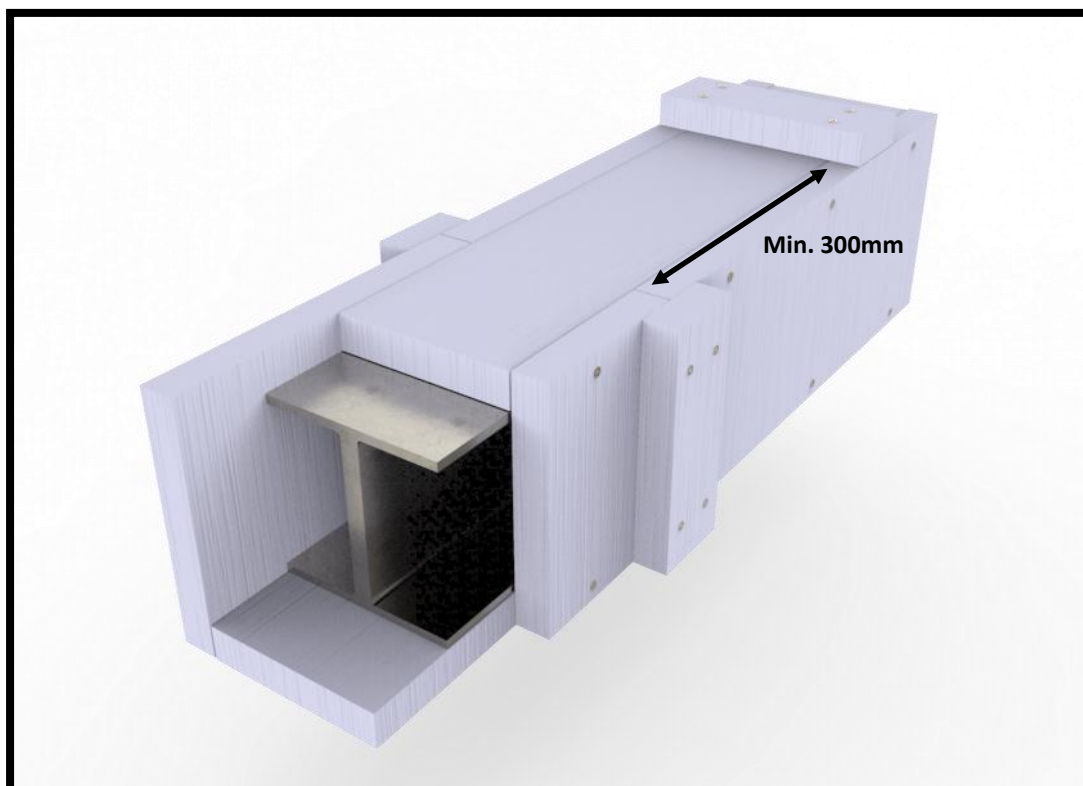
Beam Encasement Showing Cover strips and Board Joint Stagger
